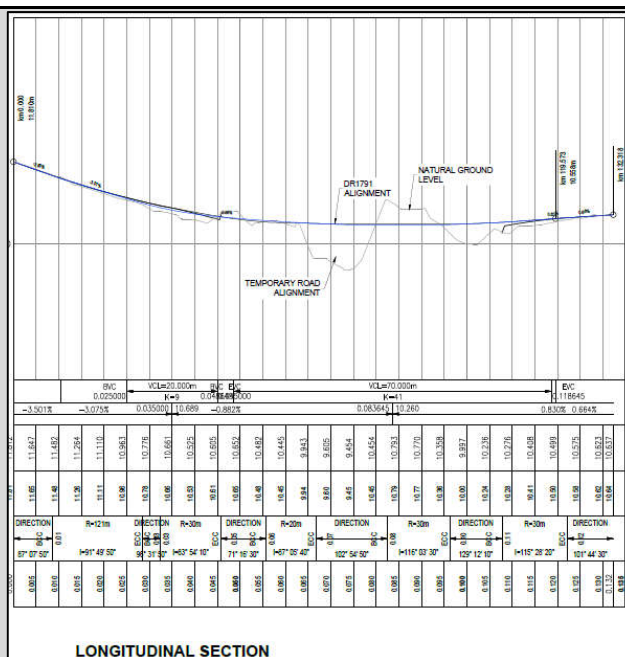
Downstream engineering design for the proposed causeway construction along DR1791, (Hatch Engineering, 2025).
